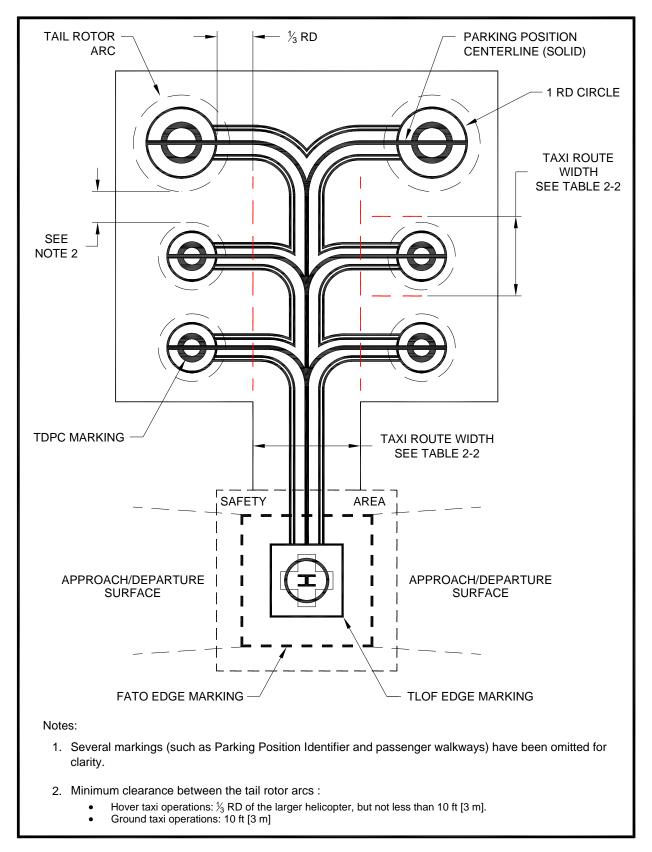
Parking Area Design – "Turn-around" Parking Positions: Hospital
